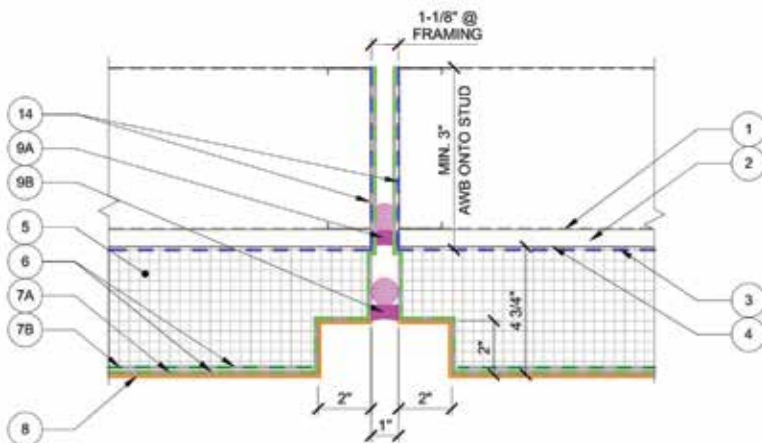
Typical vertical joint between EIFS-clad wall panels, with a centred reveal and dimensions providing clearance to install and inspect both primary and secondary joint sealants.
